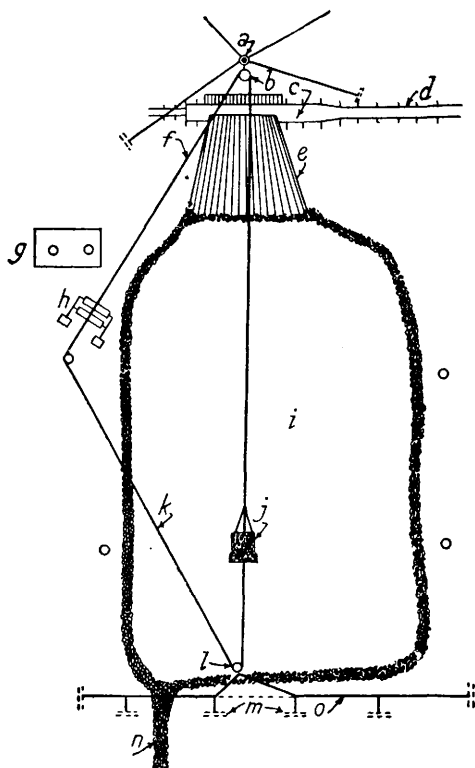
Typical slip-scraper arrangement: a, Gin pole; b, lead sheave; c, dump box; d, sluice; e, timber incline; f, lead cable; g, boiler house; h, 2-drum hoist, 8½ by 10½ inches; i, pit, 150 by 250 feet; j, slip scraper, ¾ cubic yard; k, haulback cable; l, haulback sheave; m, deadmen; n, bedrock drain; o, 1-inch anchor cable
